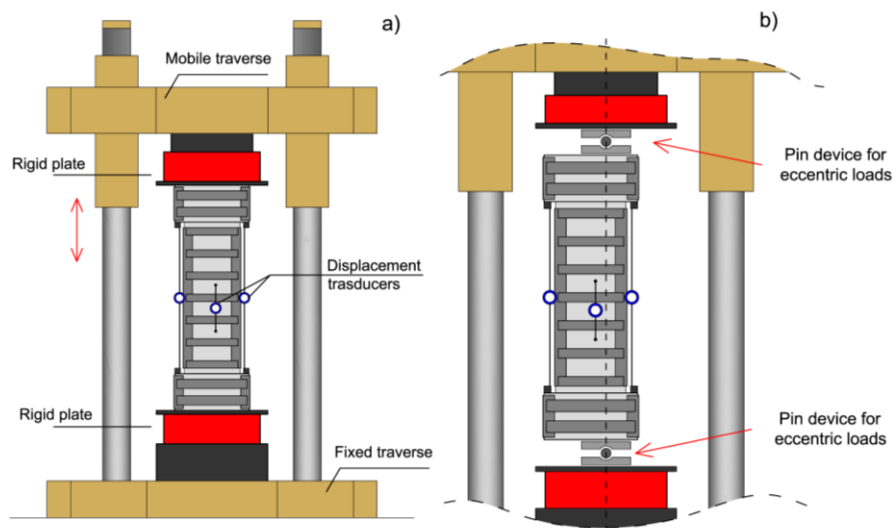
Test setups: (a) axial compressive tests; eccentric compressive tests.
